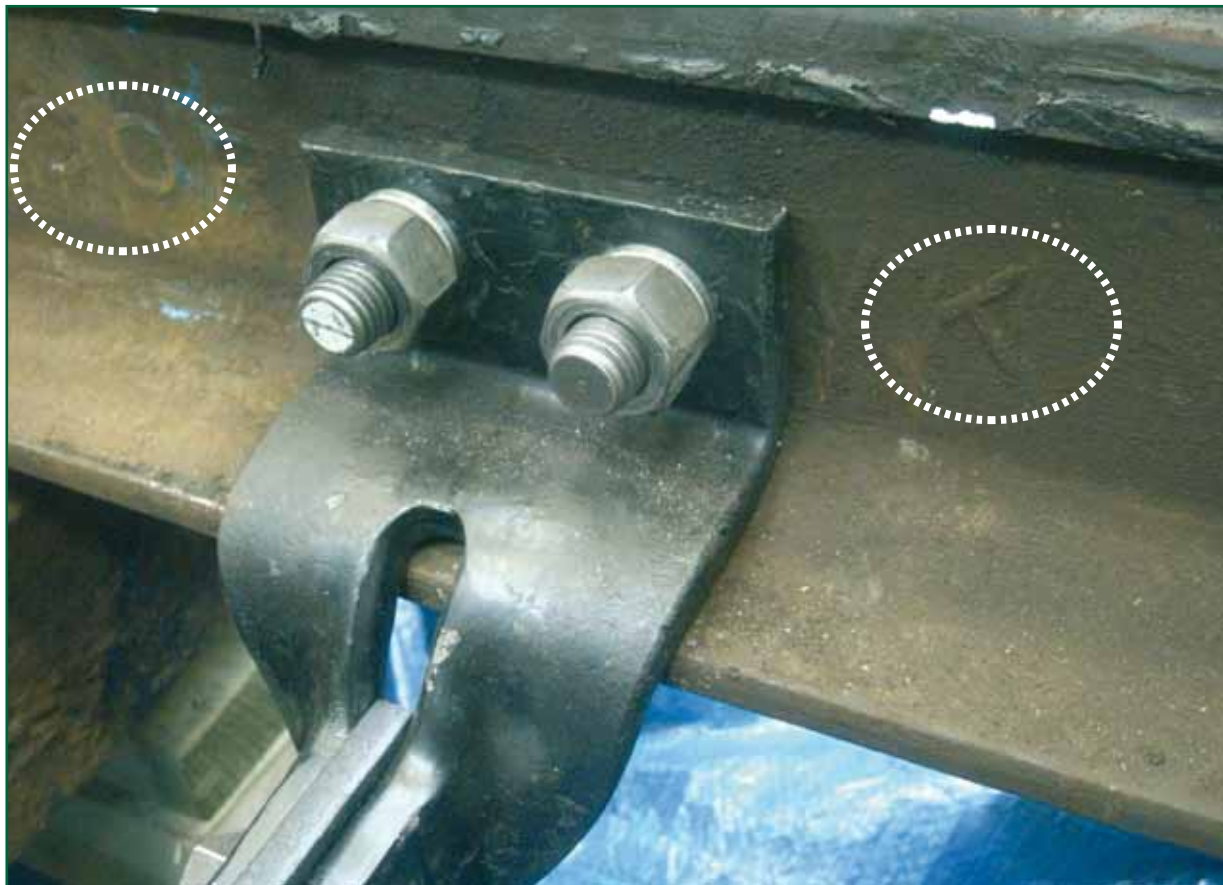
Rail branding on right-hand switch rail (Note: a new bracket has been added for testing purposes)
